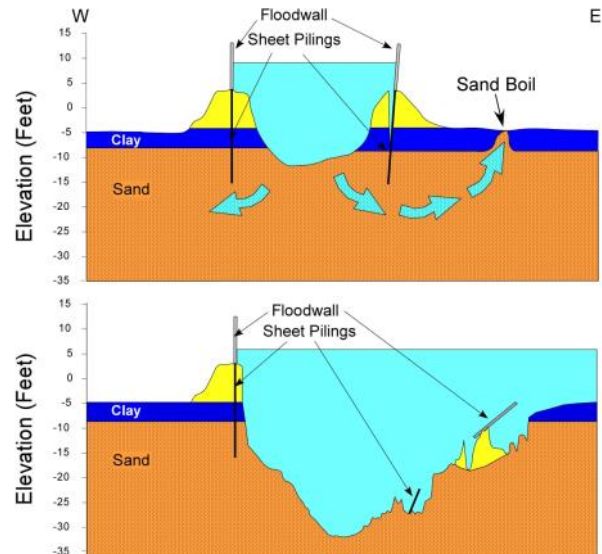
Seepage and piping through the New Orleans barrier sand at the London Avenue Canal south breach. Image 1812.
